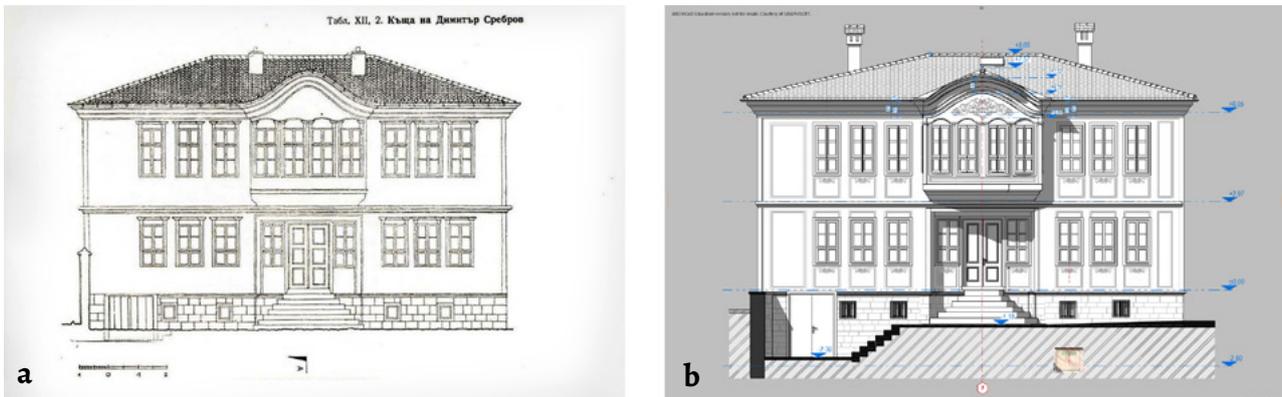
Front elevation drawings: *a)* handmade drawing from the book *Shumen Revival Houses*; *b)* generated drawing from the Architectural BIM in ArchiCAD.
